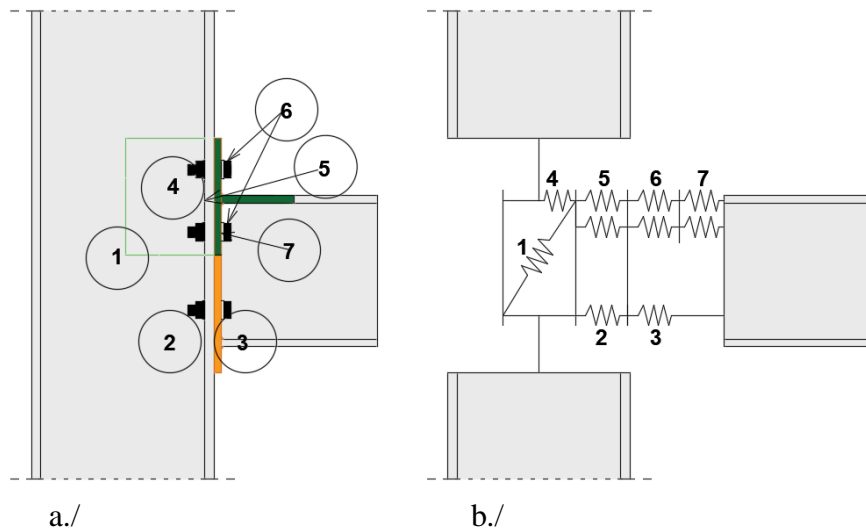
extended end-plate Steel joint a./Bolted beam-to-column connection and b./ component method
